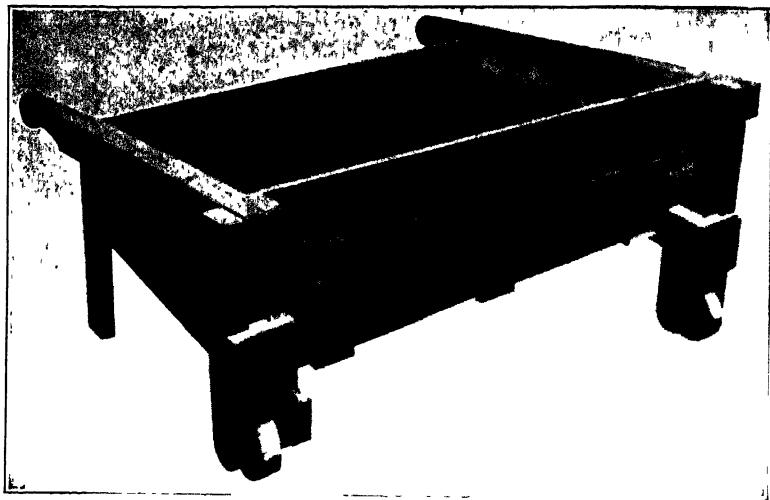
Grout Box Used in Laying Brick Pavement.
